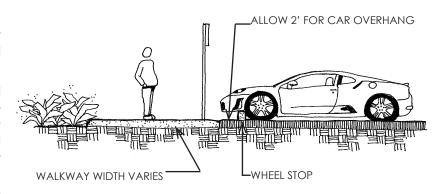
Parking Lot Curb - 0" Curb Face at ADA Parking Stalls
